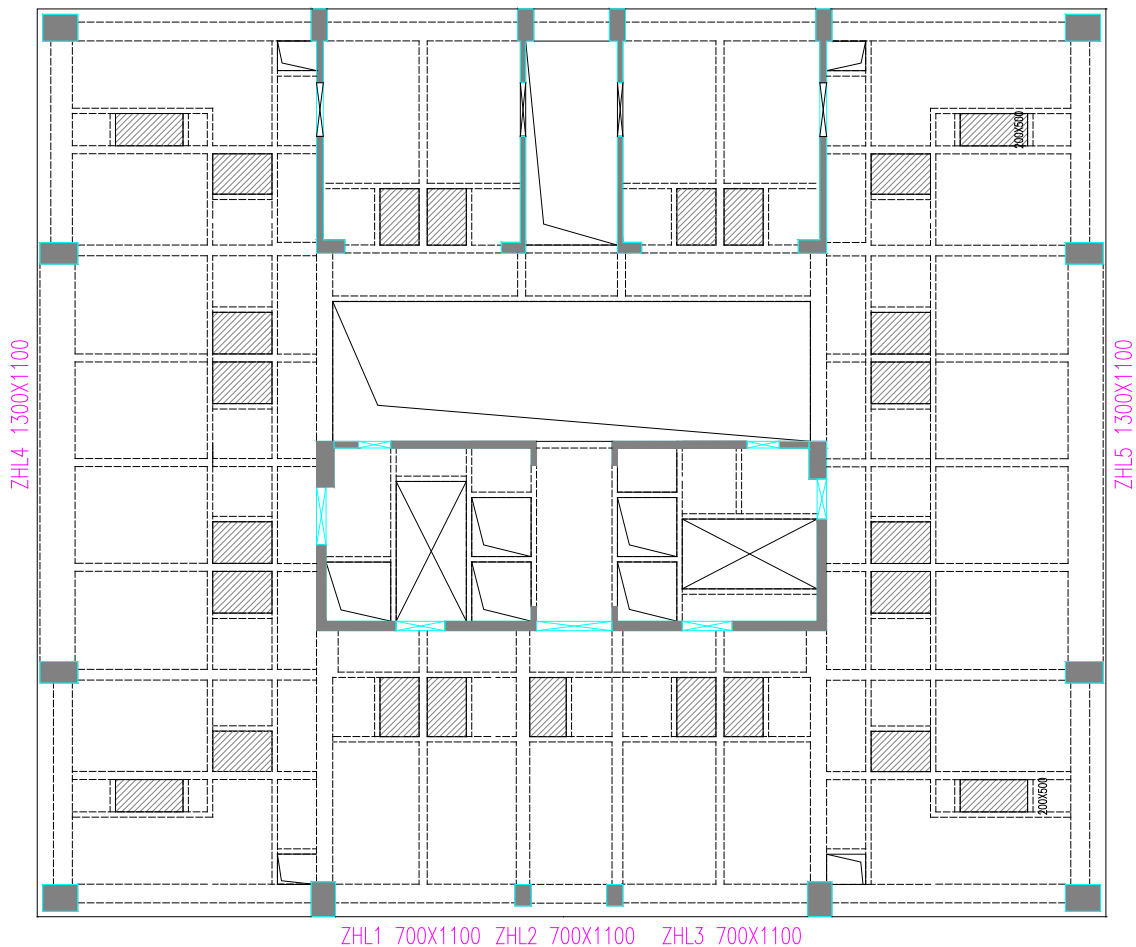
The structure arrangement plan of floor 27 in tower 2
